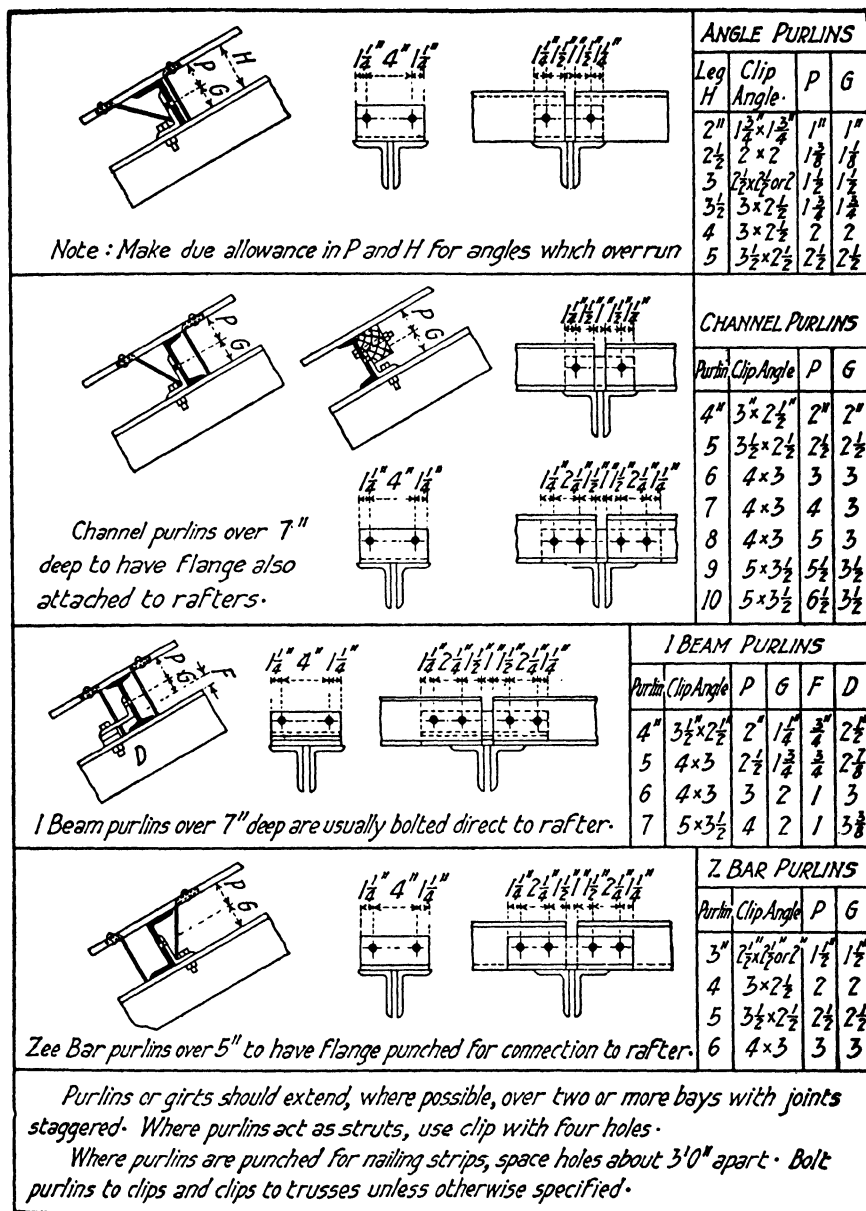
DETAILS OF PURLINS FOR CORRUGATED STEEL ROOF. AMERICAN BRIDGE COMPANY.
